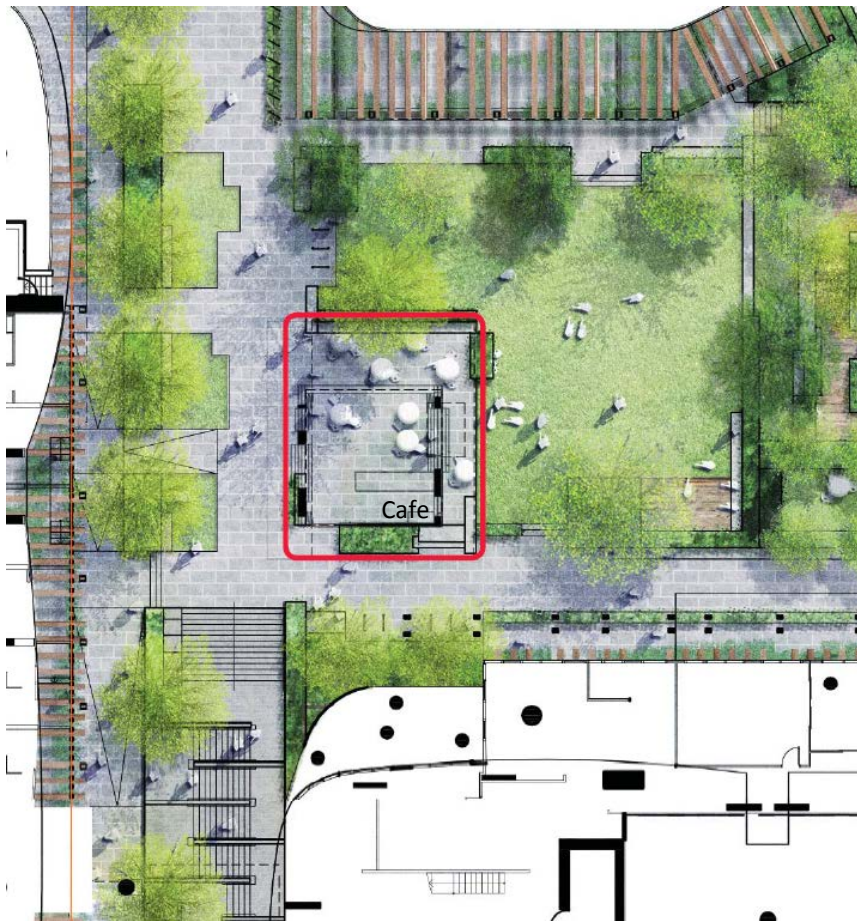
Indicative layout plan of Batman's Garden (identifying café)
